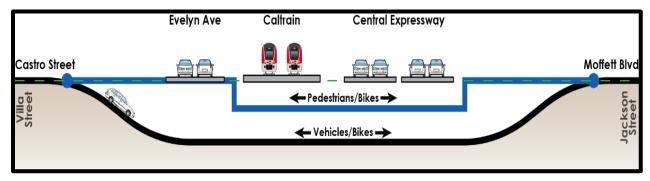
Alternative 1: Lower Castro Street and Moffett Boulevard
